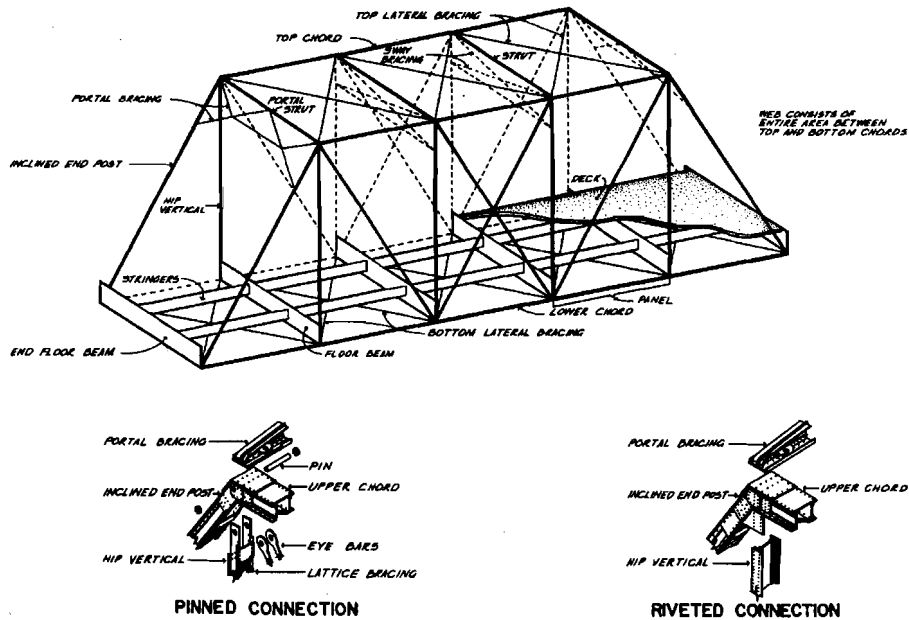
Truss Bridge Terminology. *Courtesy of Historic American Engineering Record.
